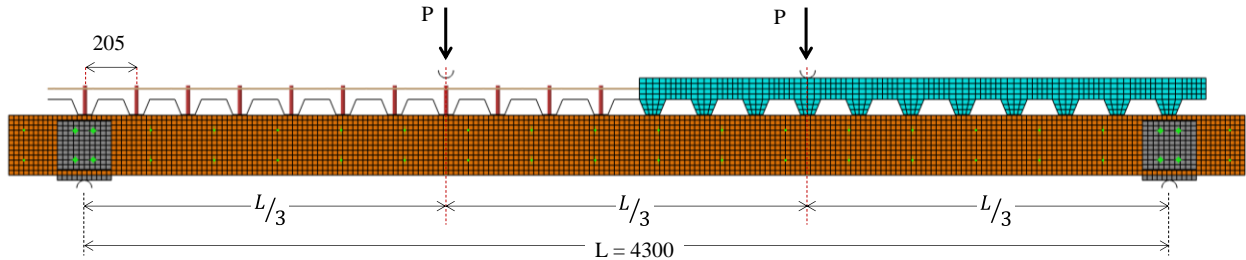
Geometry details of CFS-LWC composite beam (dimension in mm).
